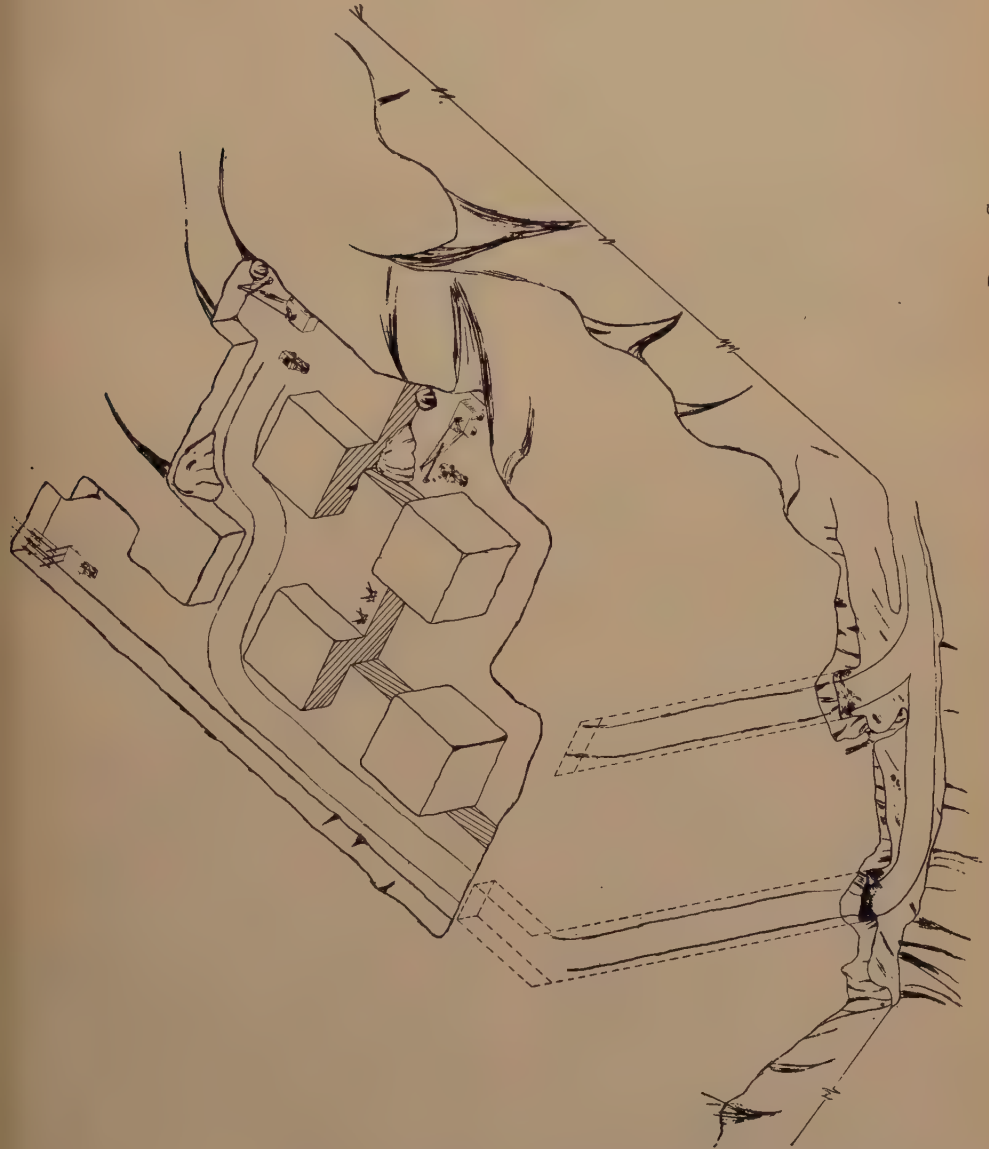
AIR-VIEW DRAWING OF PROPOSED ROOM-AND-PILLAR WORKINGS AT MINE, RIFLE, COLORADO.
